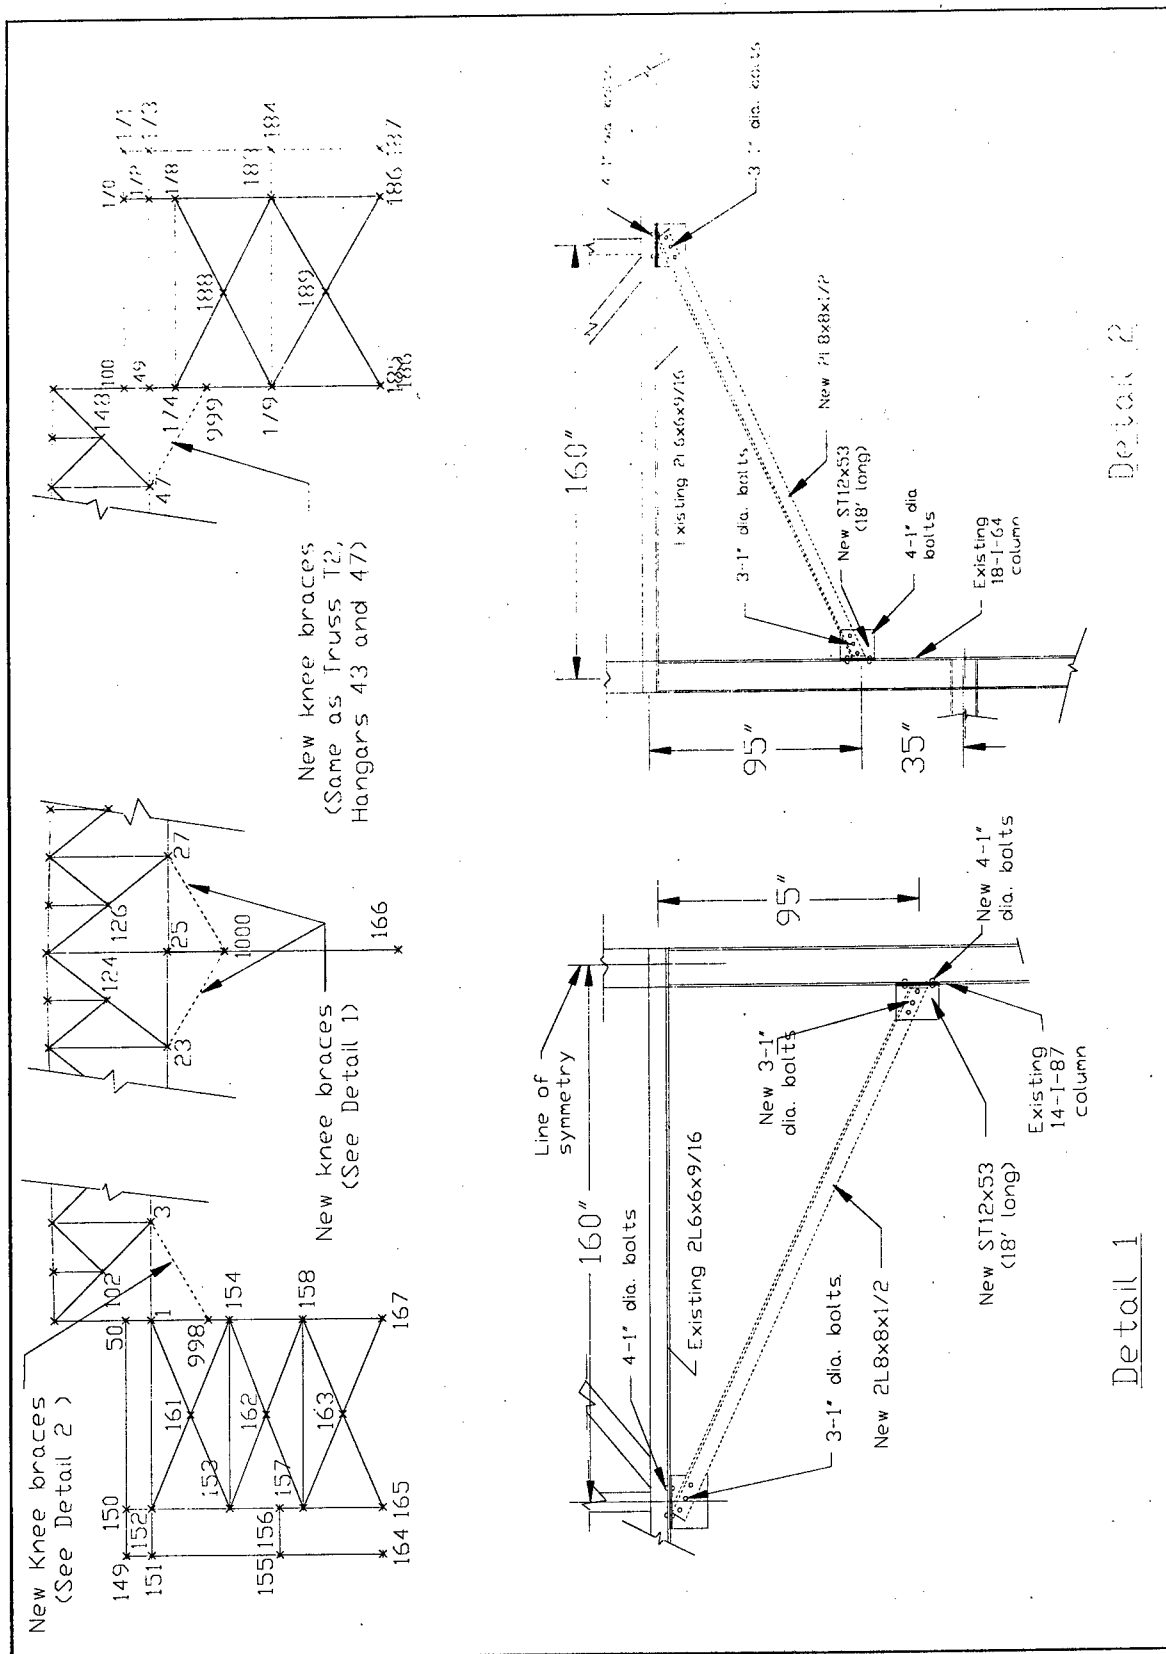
CCAD, TX, new knee braces for Truss T2, Hangars 44 and 45.
